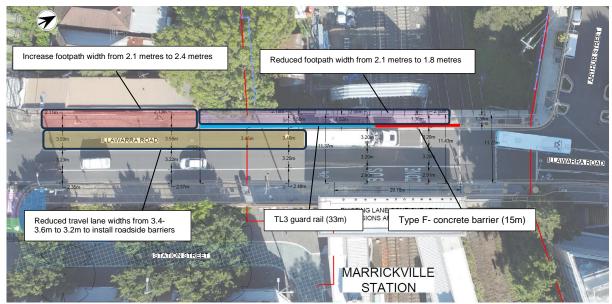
Plan of the existing lane configuration of Illawarra Road at Marrickville Station
